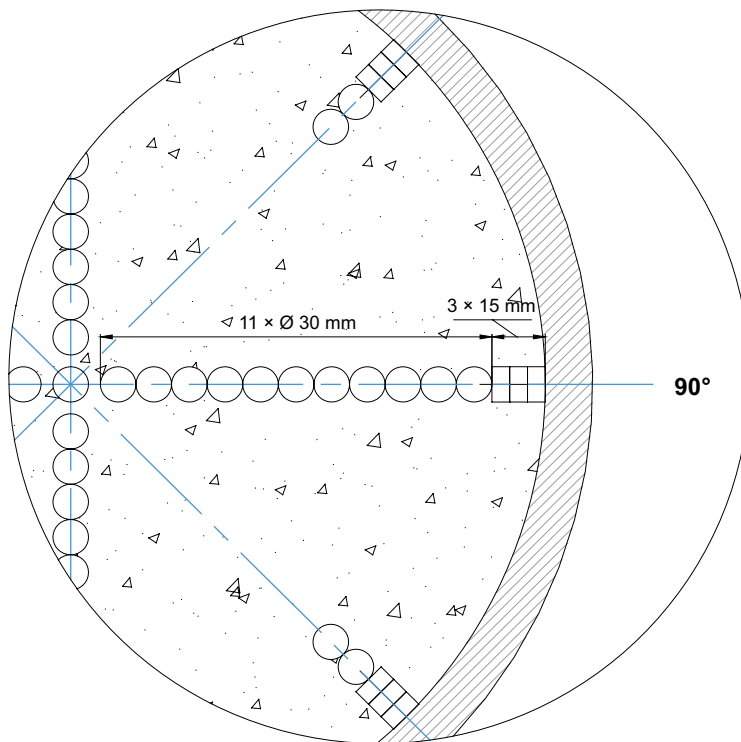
BB III. Close-up of a cross section profile showing the planned sampling of each cross section.
